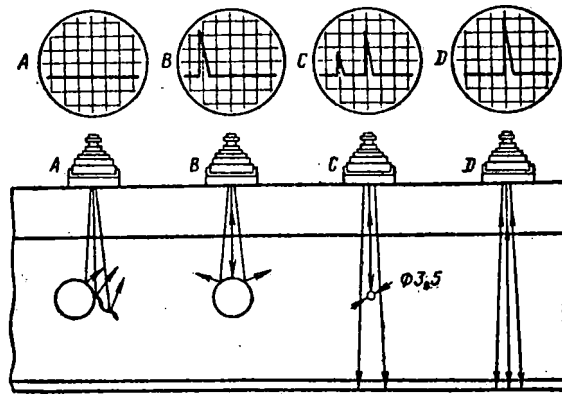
A schematic for inspecting the bolted joint of a rail.
